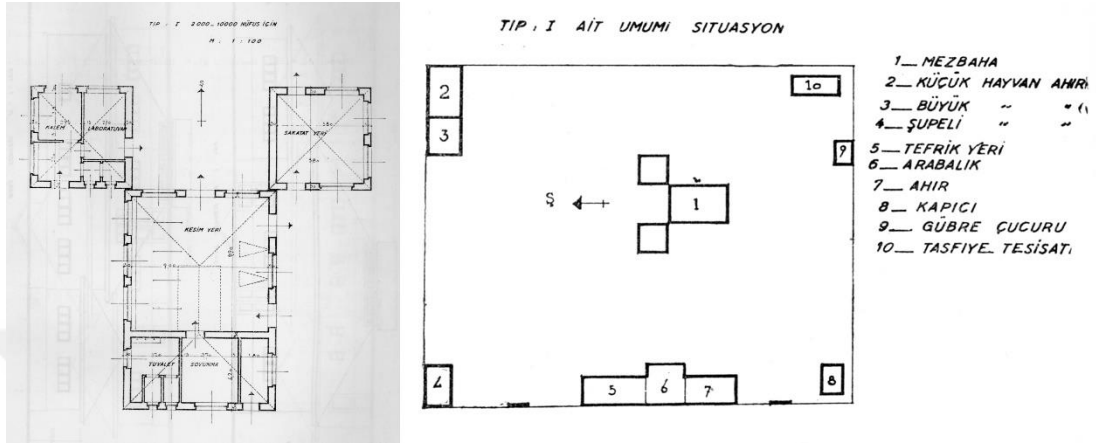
Ground floor plan and Site Plan of type-1 slaughterhouse (Source: *T.C. Bayındırlık Bakanlığı Bayındırlık İşleri Dergisi Yönetmelik Kısım.* (1936). 'Fennî Mezbahe Binaları' 2(12), pp. 44-51.)
